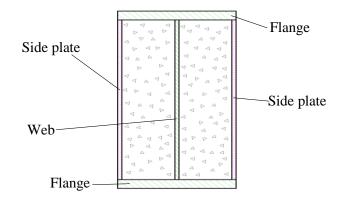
Proposed boxed I-shaped sectional CFT column
